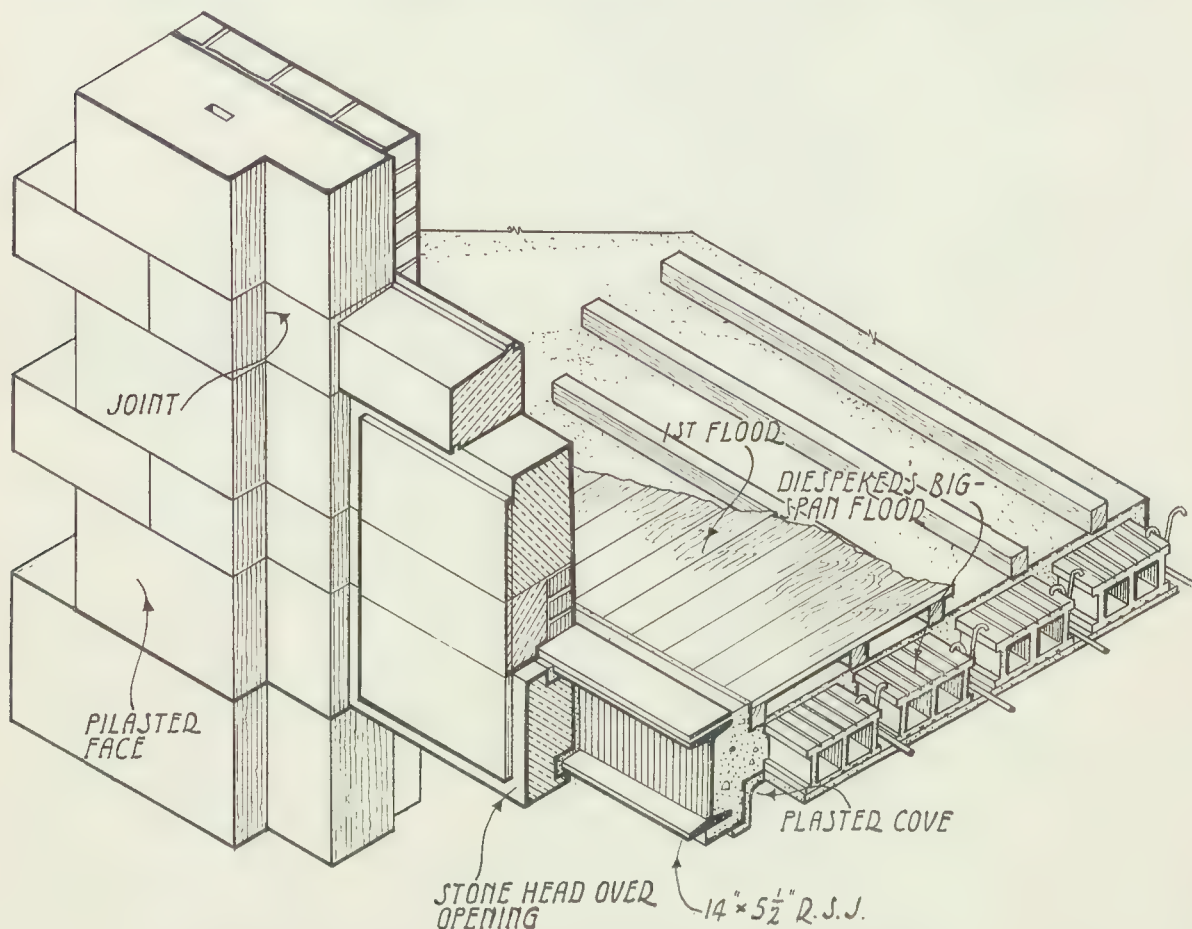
CONSTRUCTION OF "BIG SPAN" HOLLOW BLOCK FLOOR
